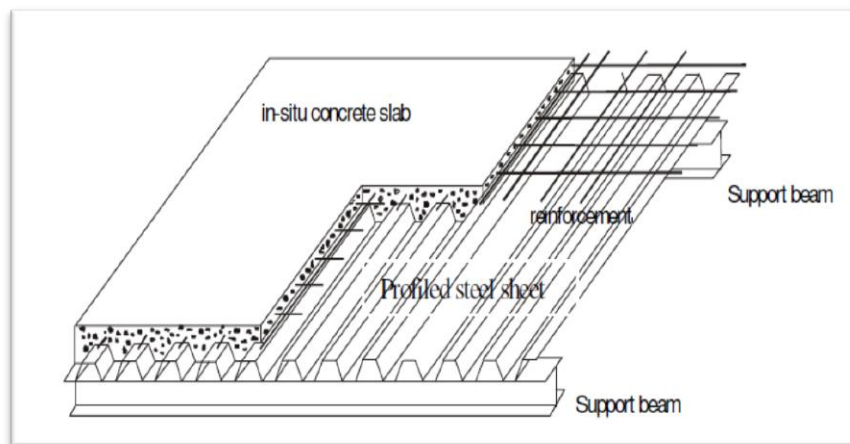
Component of deck slab (Stephen Hicks, 2008)
